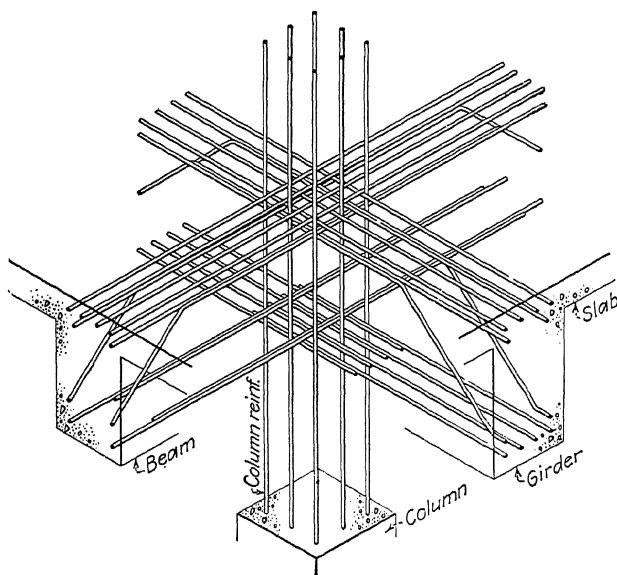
Isometric sketch showing reinforcement at junction of column and continuous beam and girder, omitting stirrups, column ties, and rods in floor slab.
